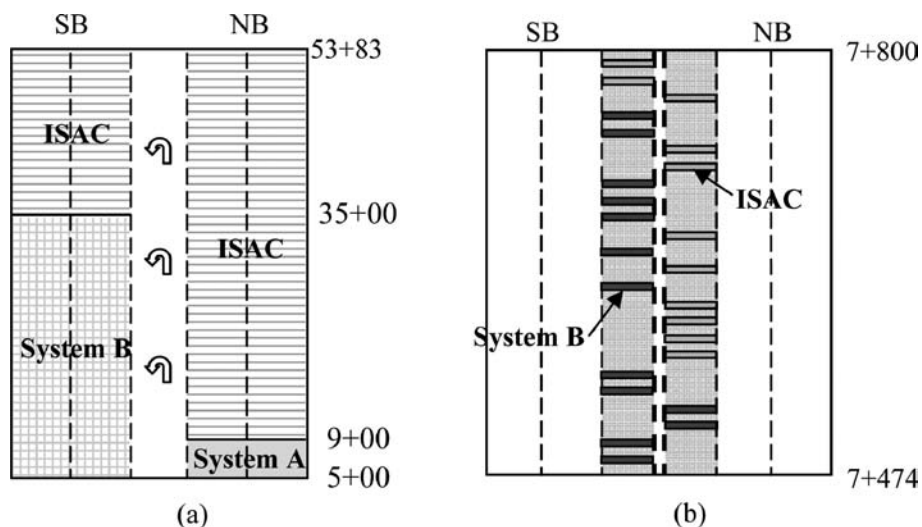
Section layout and pavement cross section: (a) Mattis Avenue and (b) IL29 Creve Coeur.
